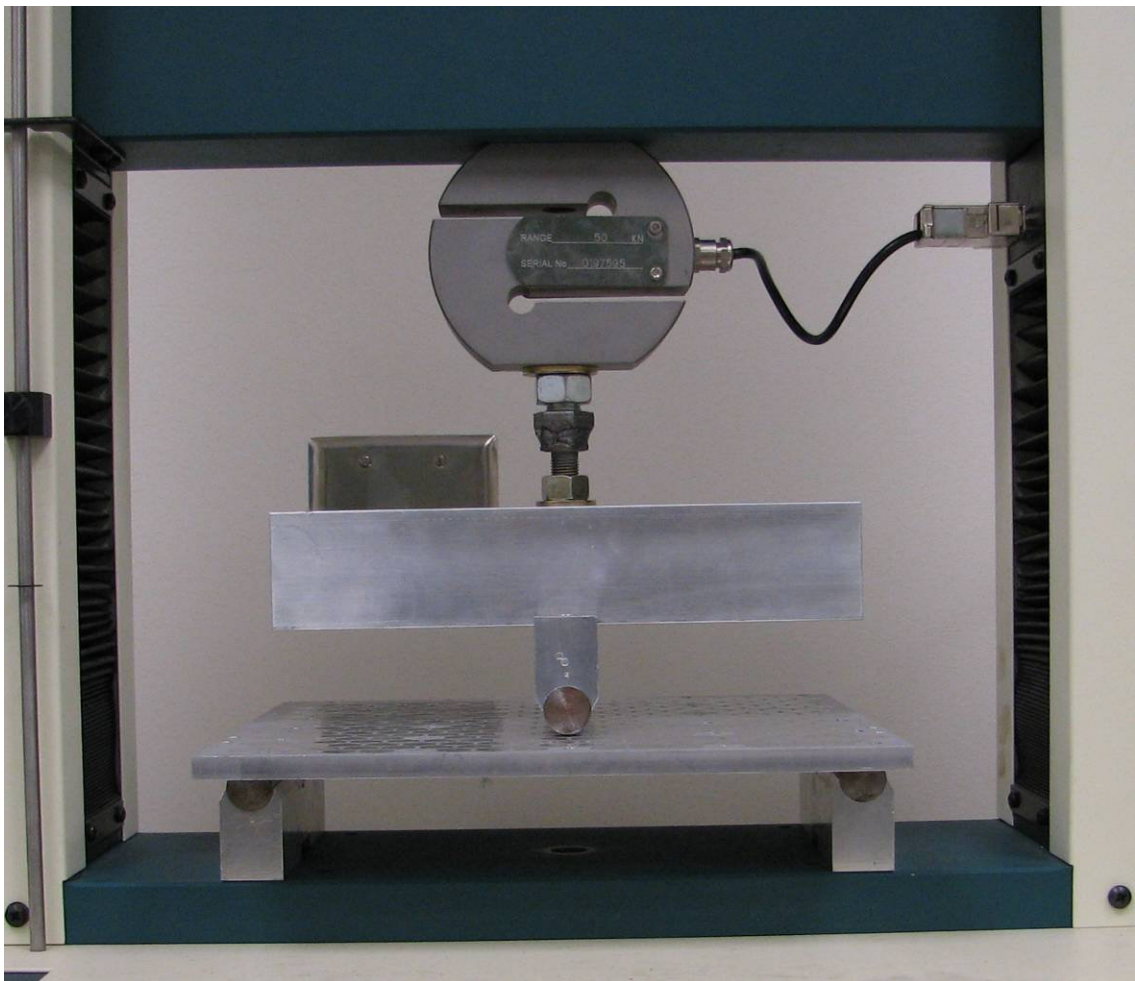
Three-point bend testing apparatus with prototype deck panel installed.
